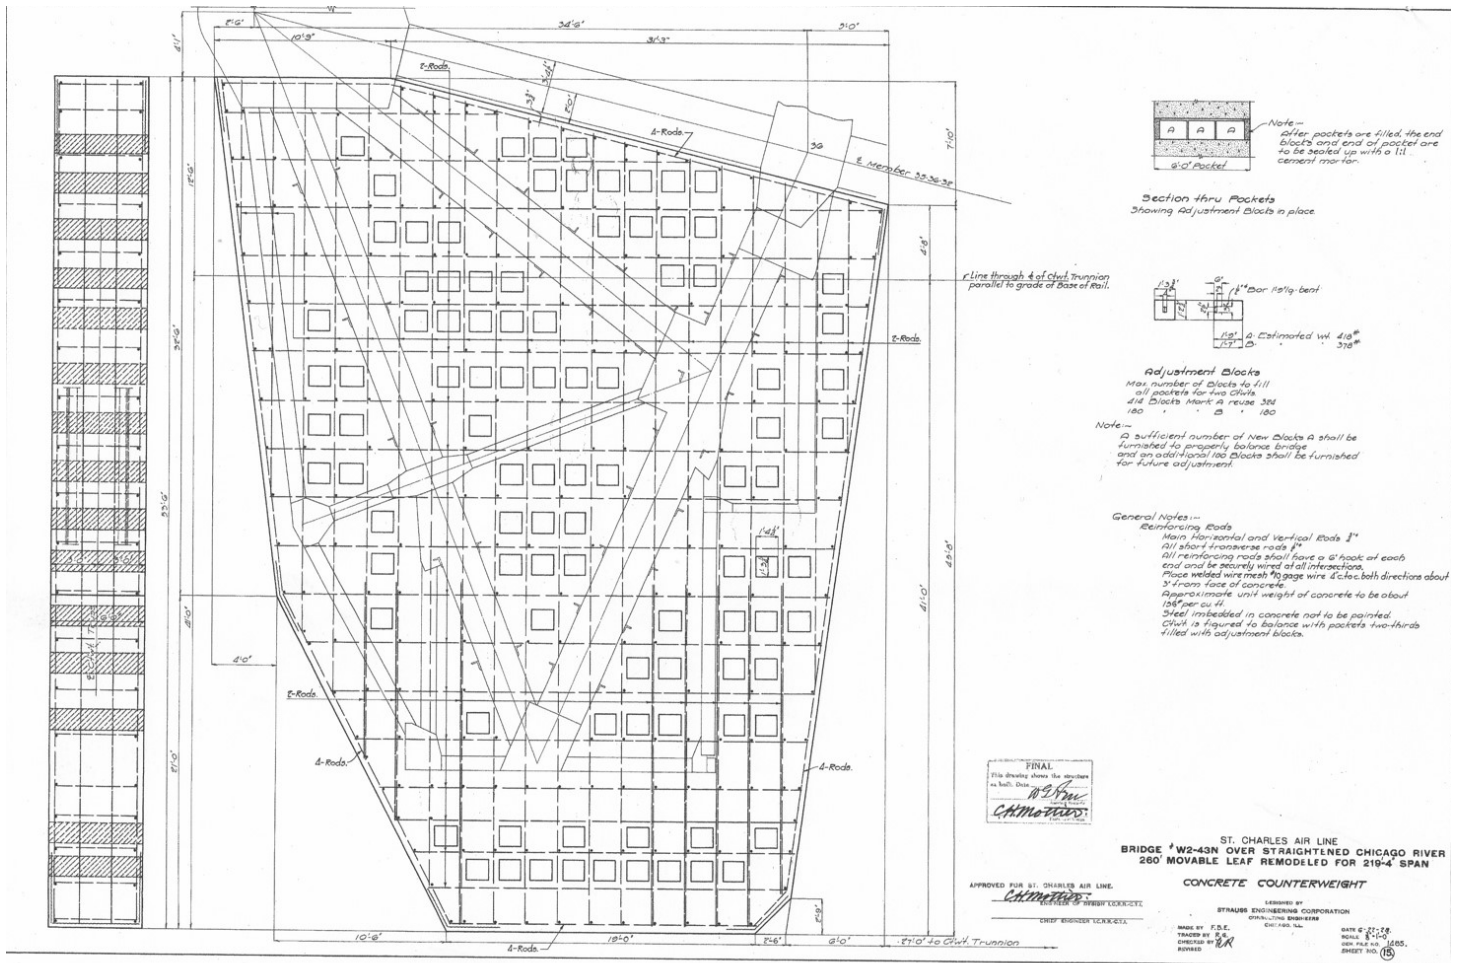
Revised Counterweight Design for the Shortened Bridge, 1930
